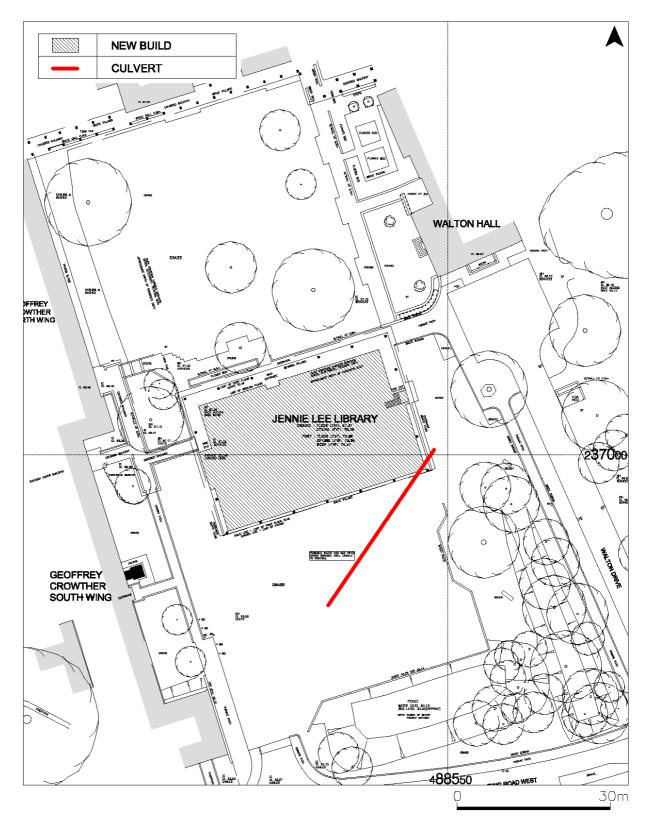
Site plan showing alignment of culvert (scale 1:750)
